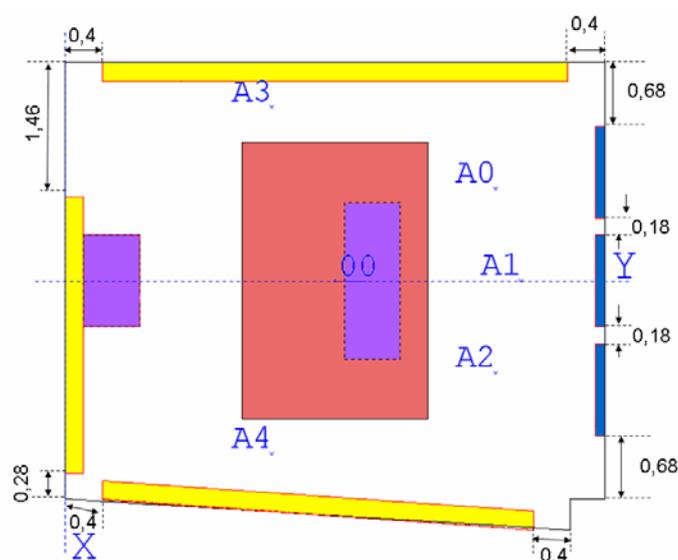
Floor plan of the listening room without the step ceiling equipped with all necessary absorbers
